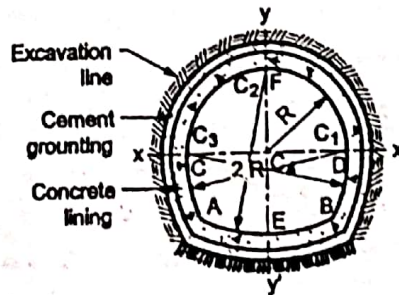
Horse-shoe shaped tunnel section
